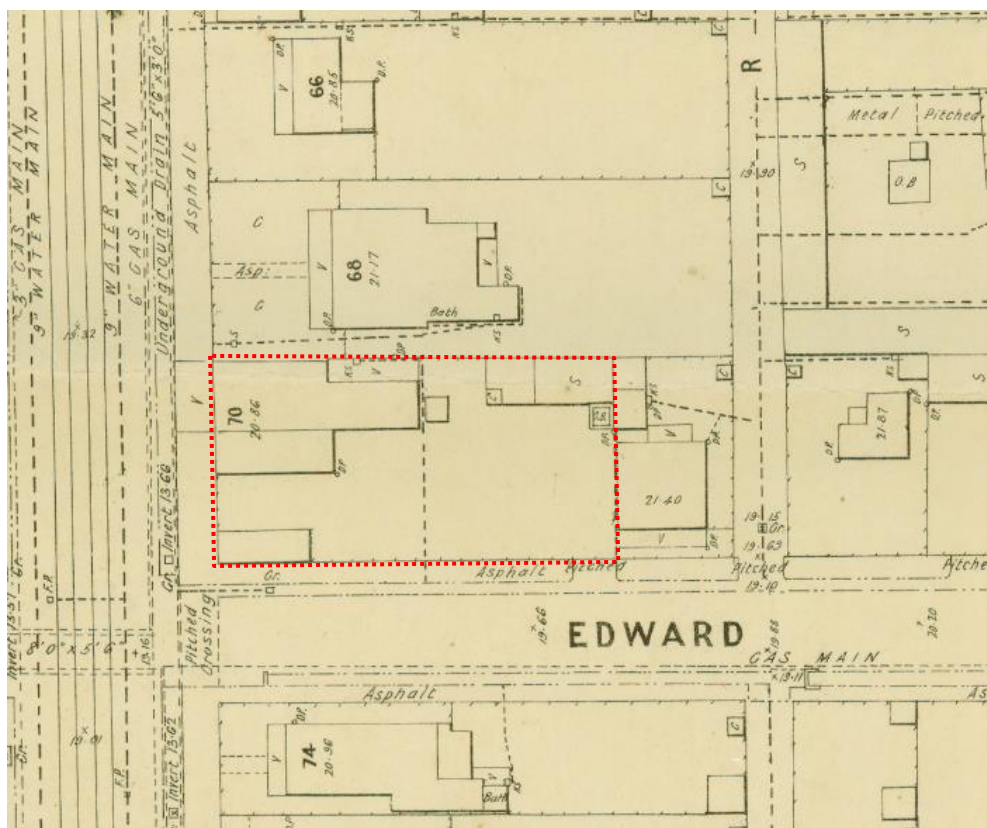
MMBW detail plan no. 1424 (dated 1897), showing the previous buildings on the subject site.
